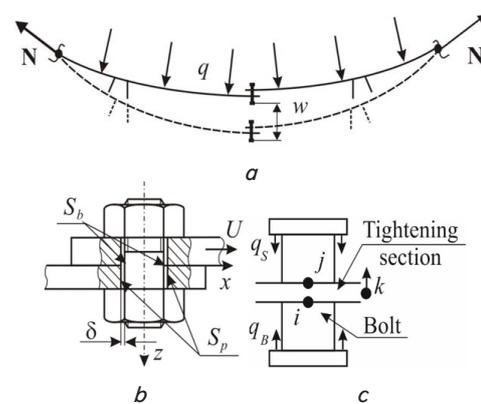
Diagram of loading of a silo element: diagram of strip connection (a); connection diagram and gaps in the bolted connection (b); model of bolted connection (c)
